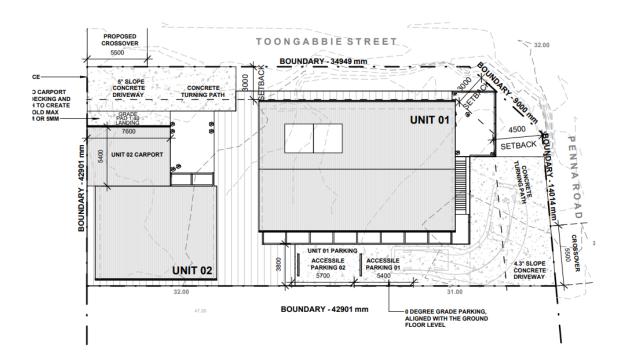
Architectural set with works proposed to the access (source: Kunama architectural set, 2024).
